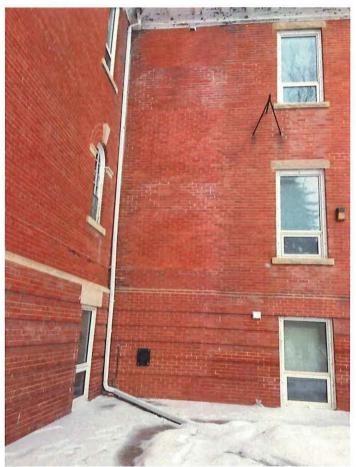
Join of 1924 addition with 1914 building - water staining on masonry from roof area above
